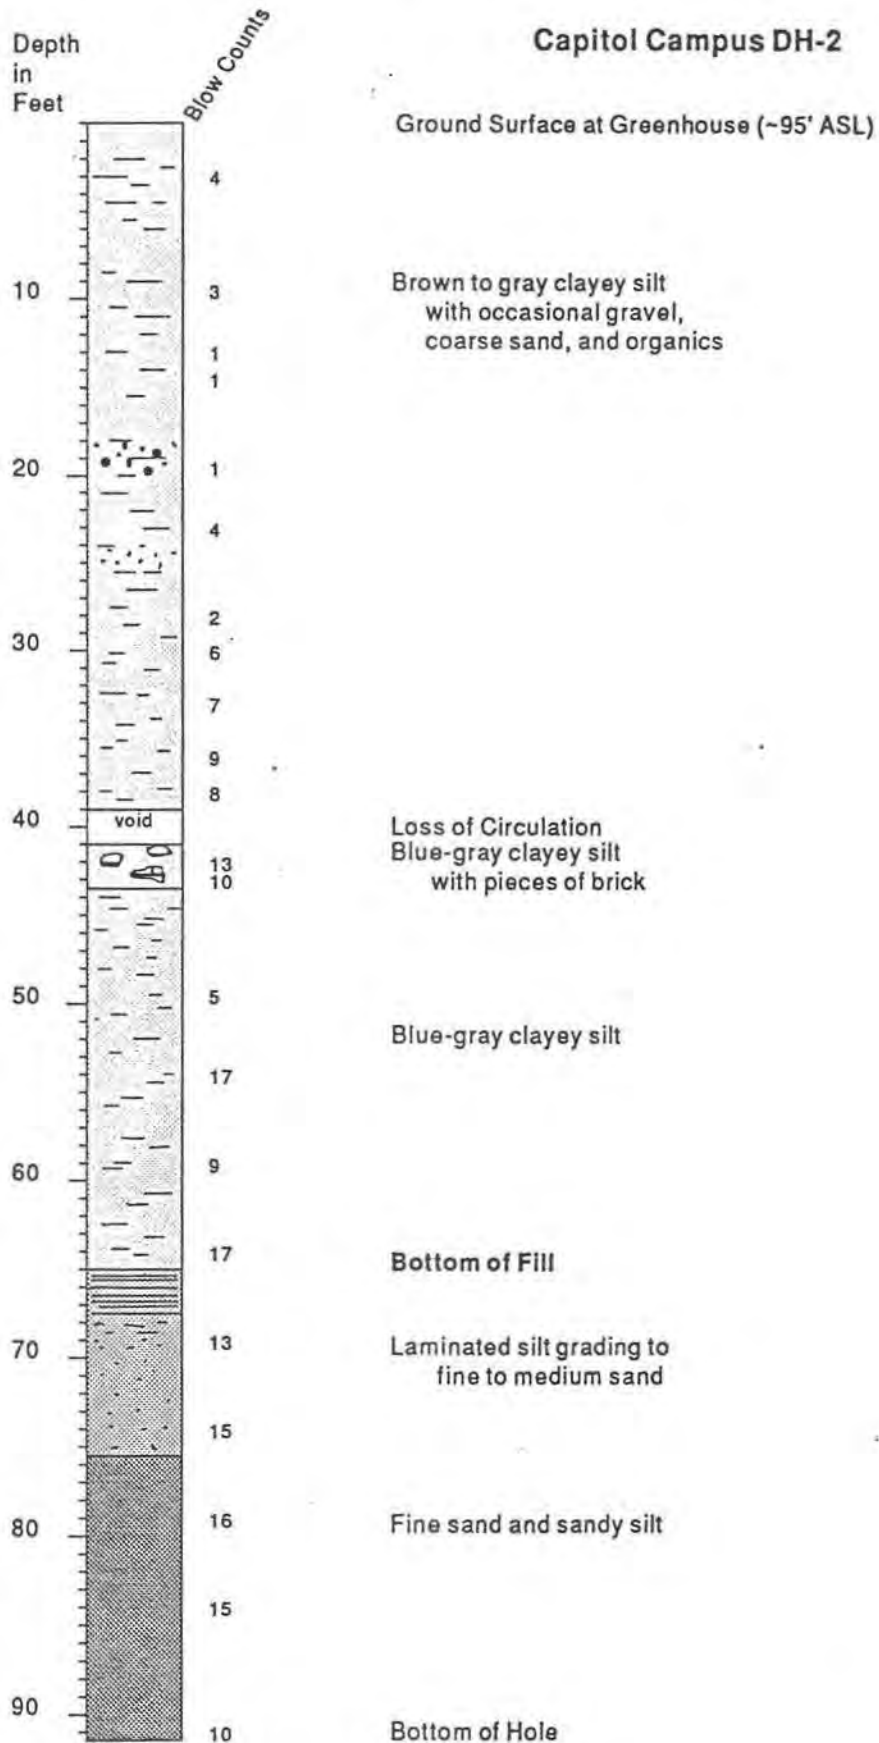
Boring log for DH-2, drilled in April, 1994, near the northwest corner of the Greenhouse building.
